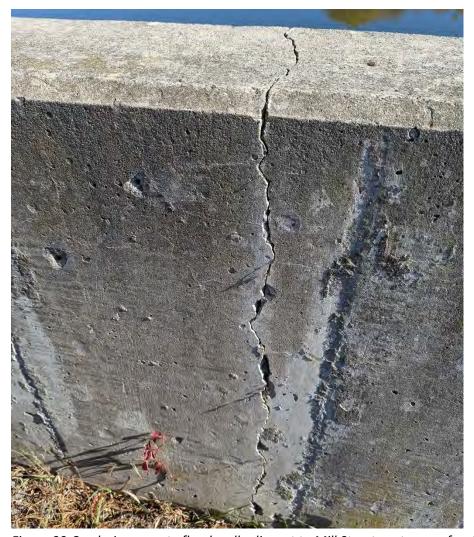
Cracks in concrete flood wall adjacent to Mill Street upstream of weir
